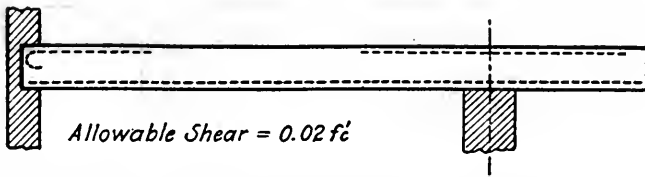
Typical Reinforced Concrete Beam; Principal Longitudinal Bars Without Special Anchorage
